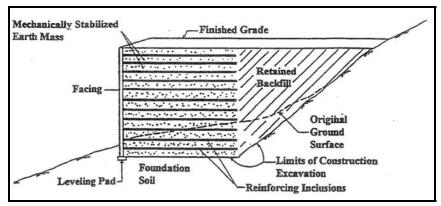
, MSE Wall (Earth Retaining Structures – June 2008)
